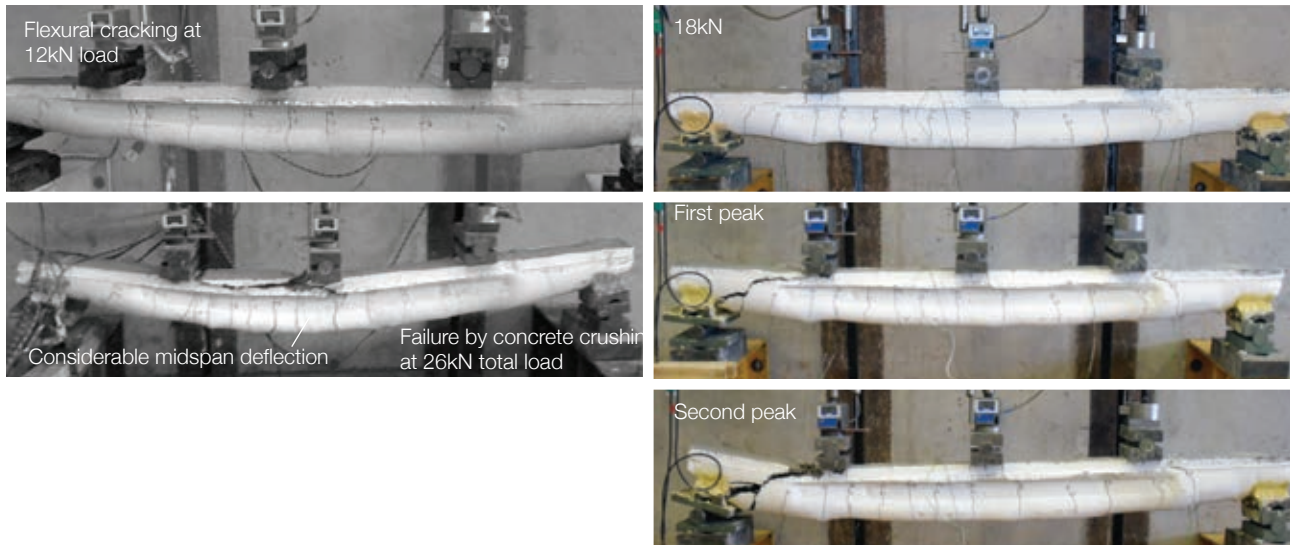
Test photographs. Beam 3\_2 (l); Beam 3\_3 (r).
